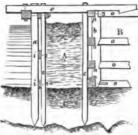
Section of coffer-dam: a, main exterior piles; b, strong square beams, corresponding to a, on which the wales n n are notched and bolted; c, sheeting-piles; e, cross-pieces; o o, horizontal shores buttressing opposite sides of dam; A, puddling; B, interior space; C, mud, etc.
